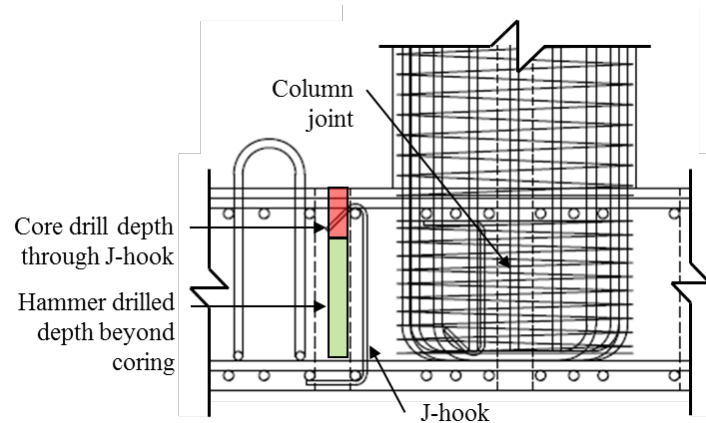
Repair bar drilling to avoid J-Hooks in specimen footing
